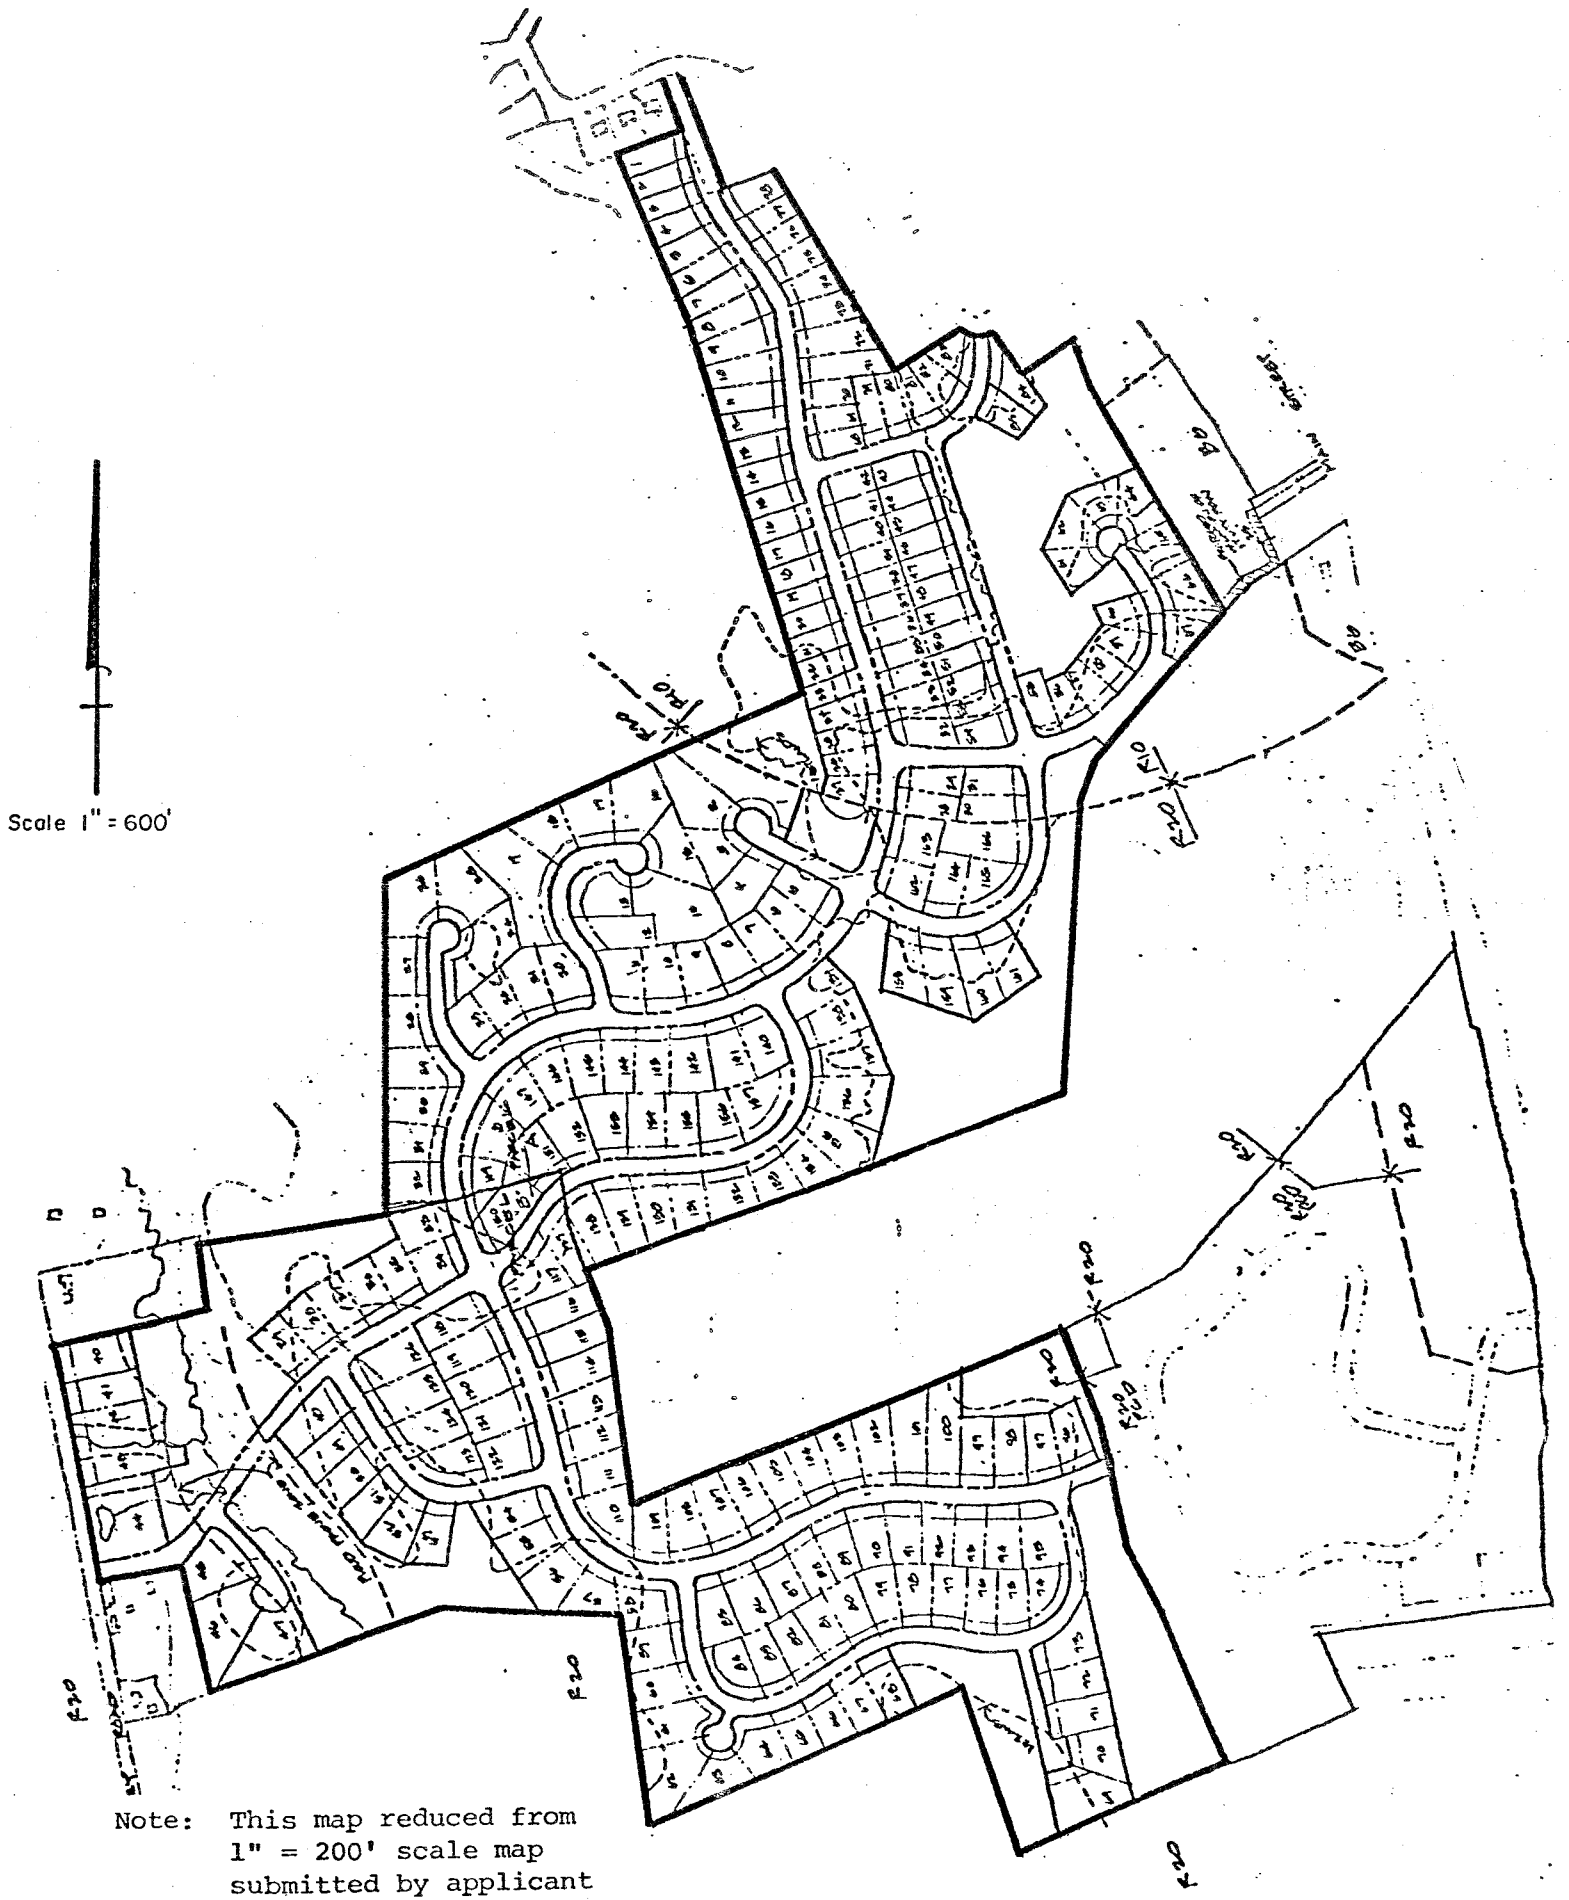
SITE PLAN A- CLUSTER PROPOSAL
